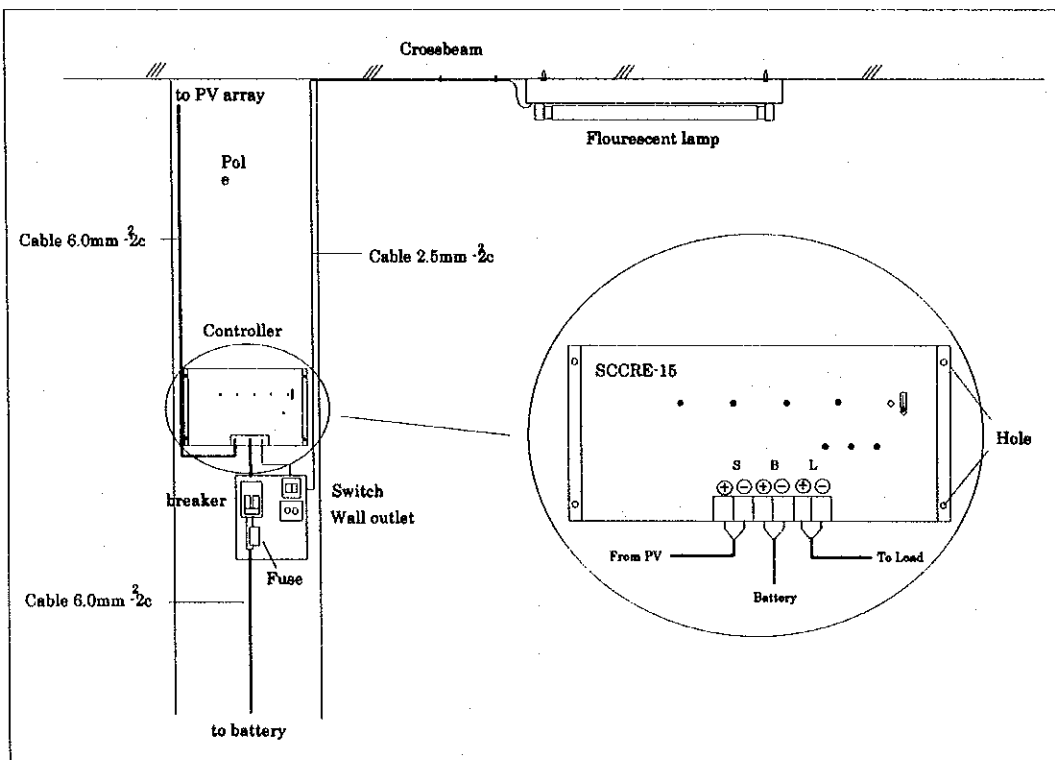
Installation drawing of the controller and other indoor equipment(Example)
